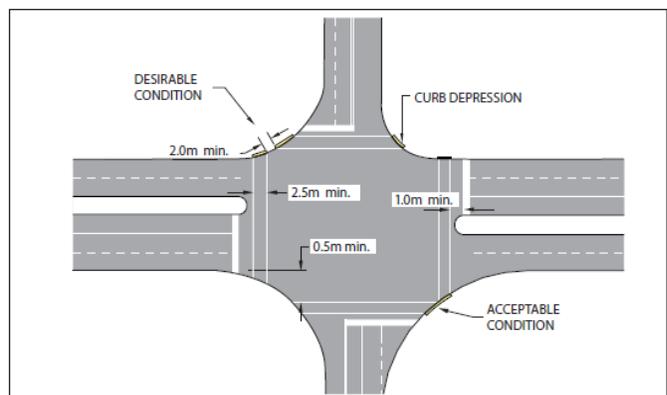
Typical Crosswalk Design with Standard Crosswalk Markings (OTM Book 12)
